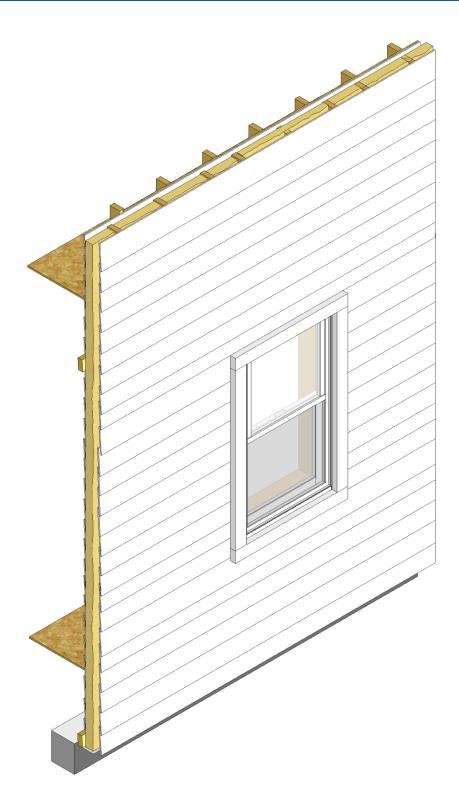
Step 15: Install the new cladding, and install the new window trim.
